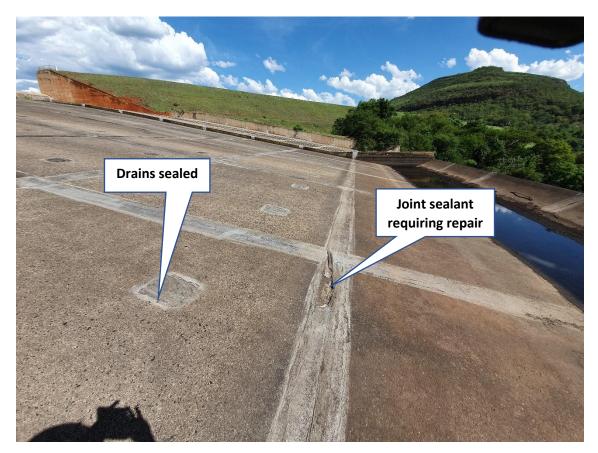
Spillway lining joint sealant requiring repair (19 November 2019). Note lining drains also sealed.
